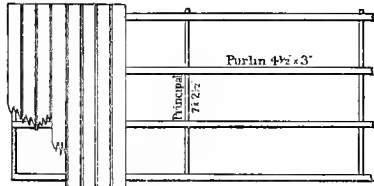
Roof for court: Elevation, showing boards, purlins, and principals.
